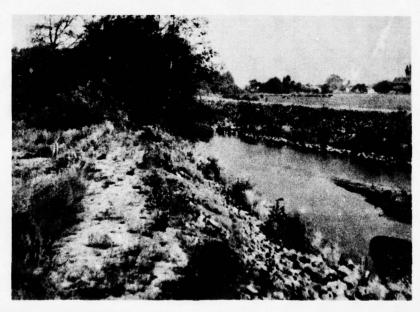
The levee constructed by Clallam County extends to the trees on the left bank. The levee constructed by the Corps of Engineers is on the right bank. View is downstream from the newly constructed county bridge at river mile 0.8.
